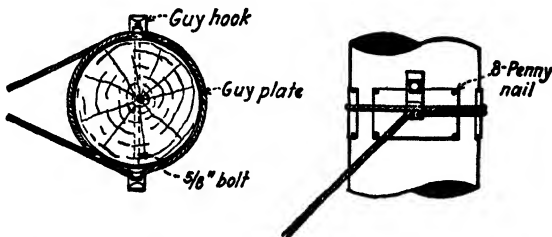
Method of fastening guy wire to pole. Sketch shows use of guy hooks and plates.
